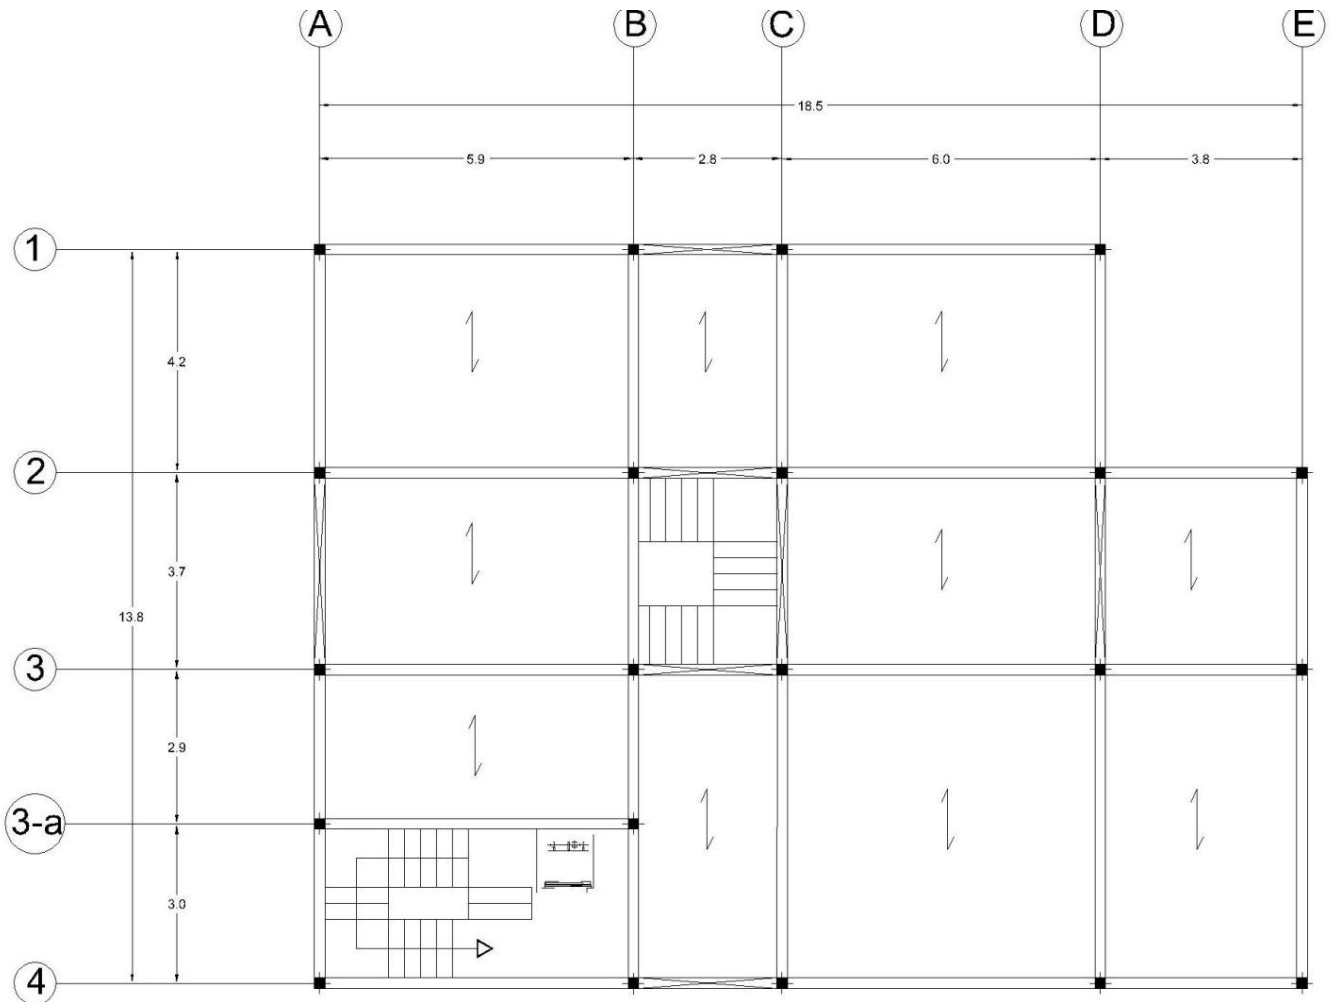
4. Typical plan of ground, first and second floor with secondary beam directions
